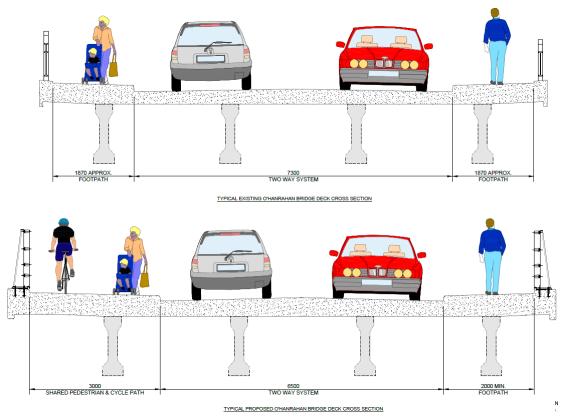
Cross Section of Existing and Proposed Carriageway (dimensions in mm)
